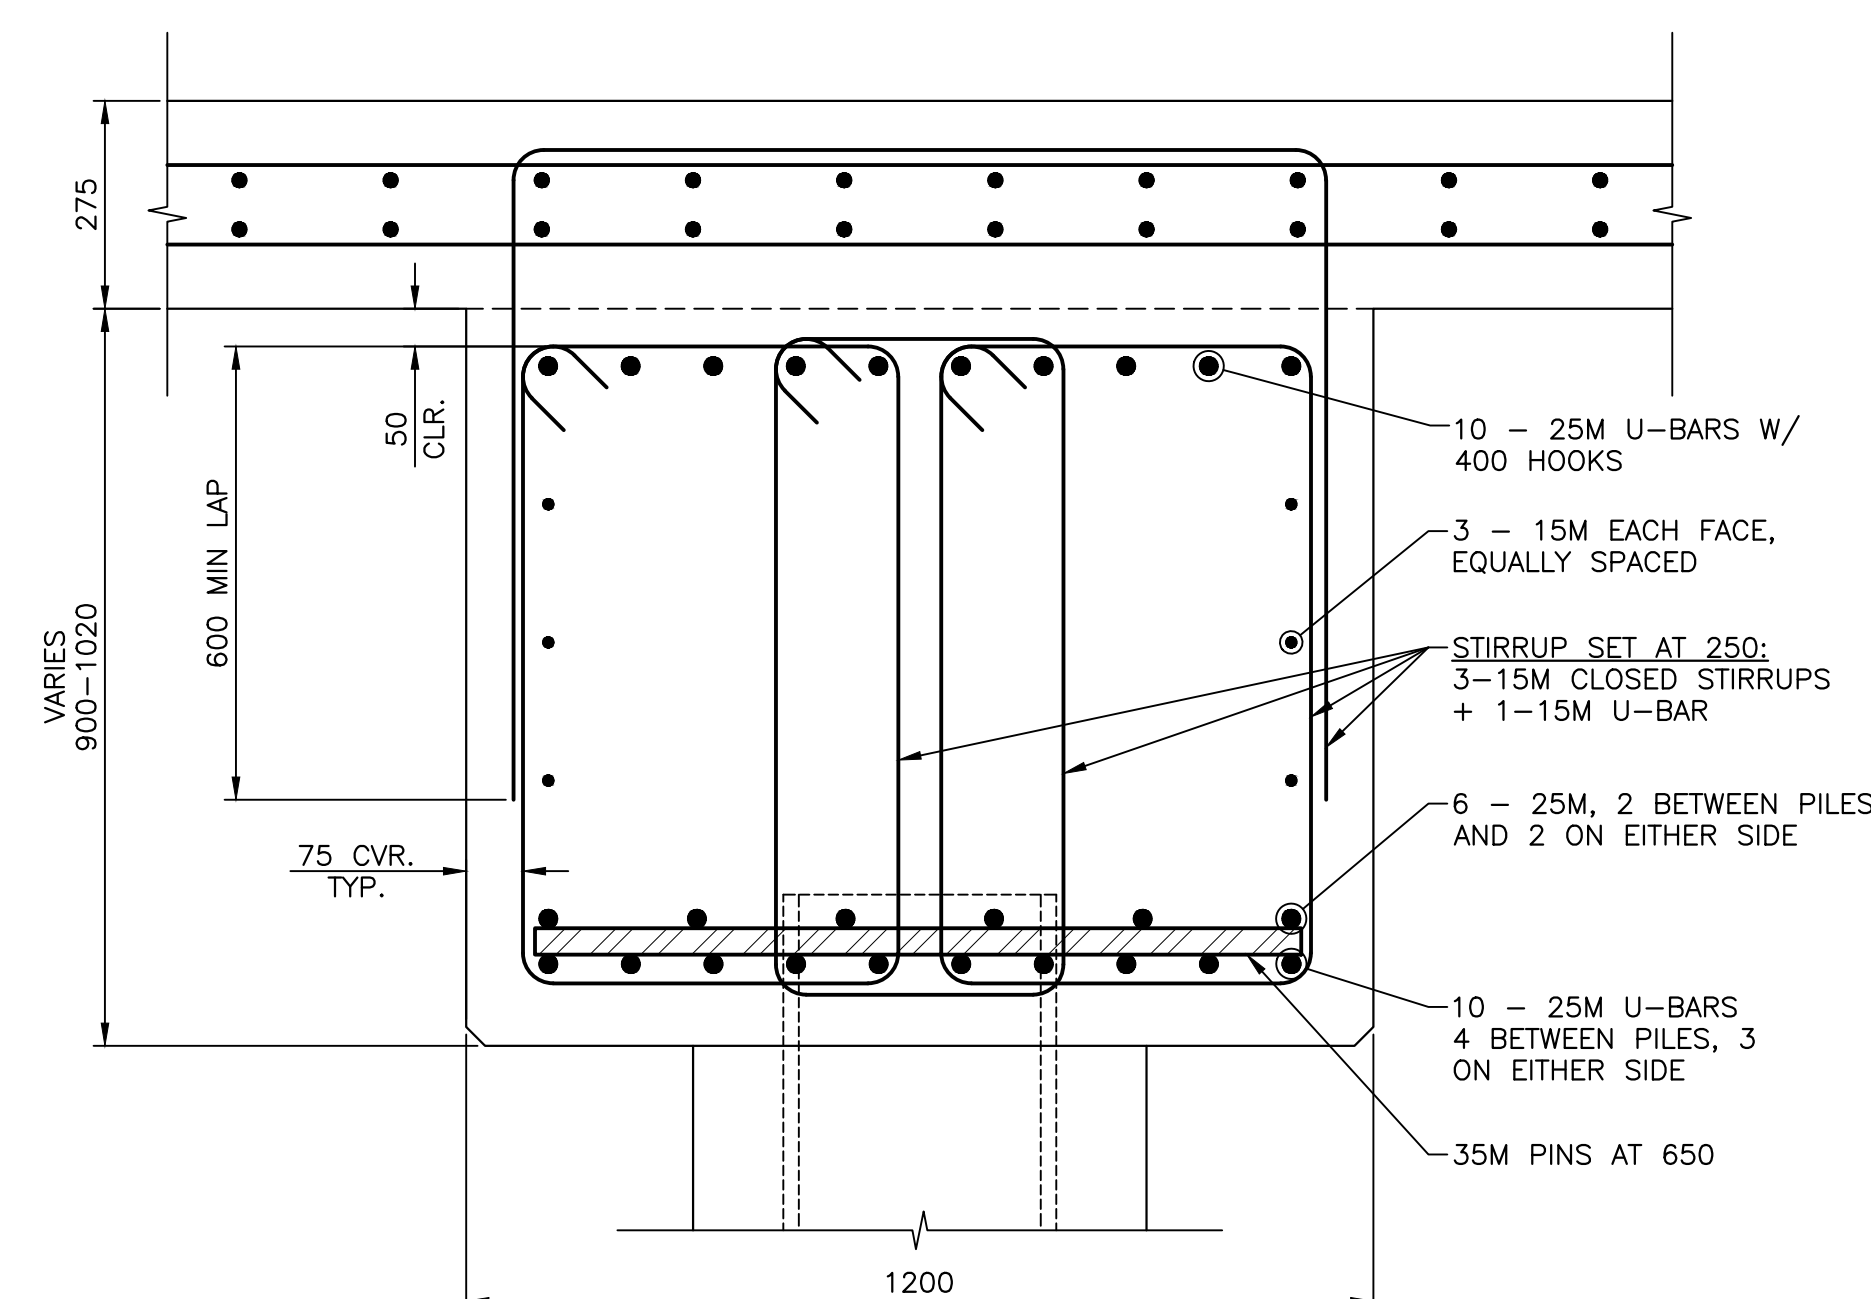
DETAIL - CONSTRUCTION JOINT / REINFORCING SPLICE (3) S17
